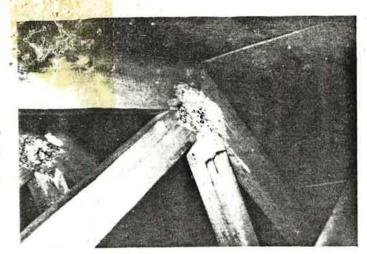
Black mould on roofing timbers and rusting of gang-nail fixing.
